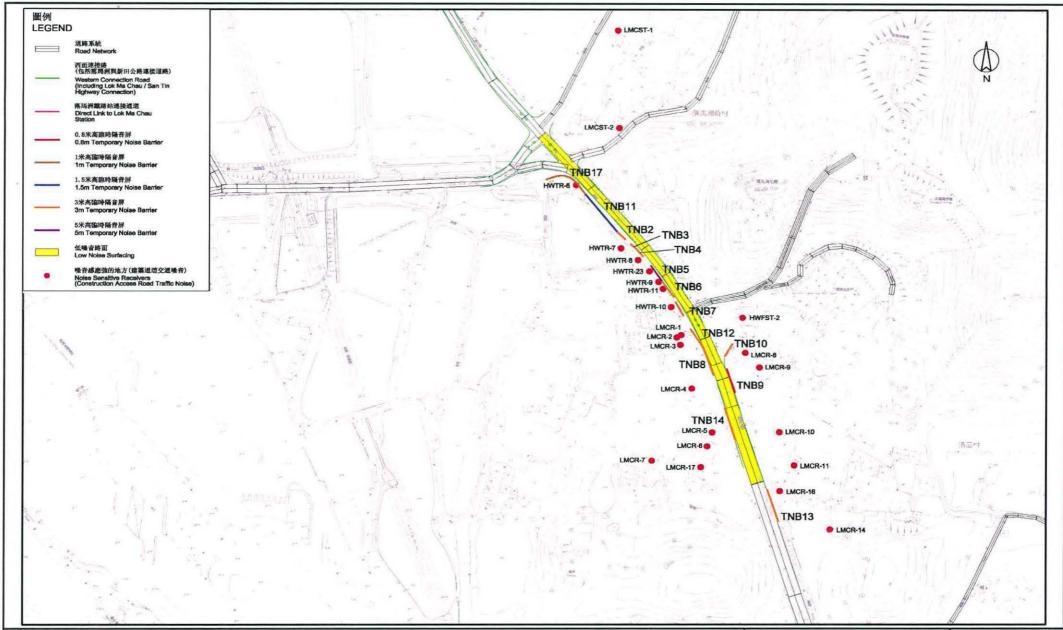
Extents and Locations of Construction Stage Temporary Noise Barriers After the Commencement of Road Widening Works of the Western Connection Road at the Existing Lok Ma Chau Road (Sheet 2 of 2)
